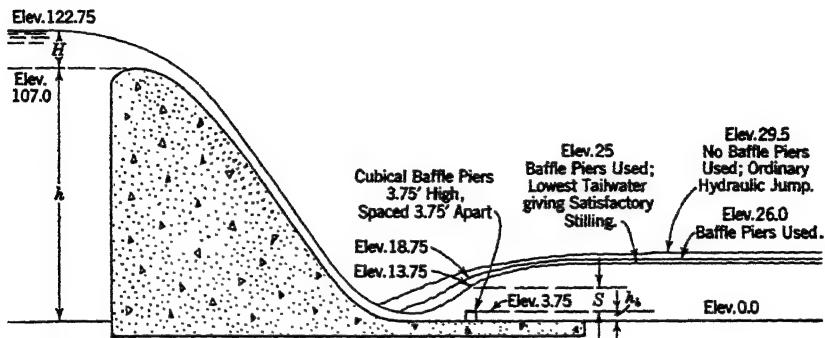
Test of baffle pier effectiveness, using a spillway model built for studies on the Red Bank Dam.
